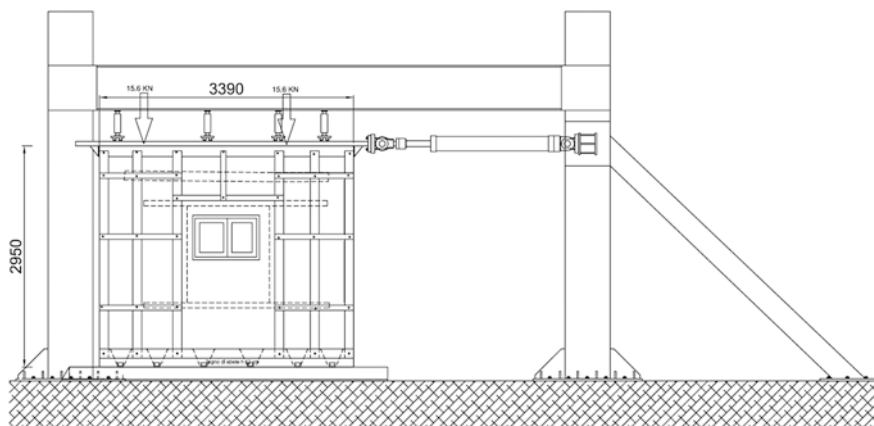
Full-scale specimen of a masonry wall reinforced with a timber frame built according to the Borbone constructive system. Laboratories Ivalsa—CNR
